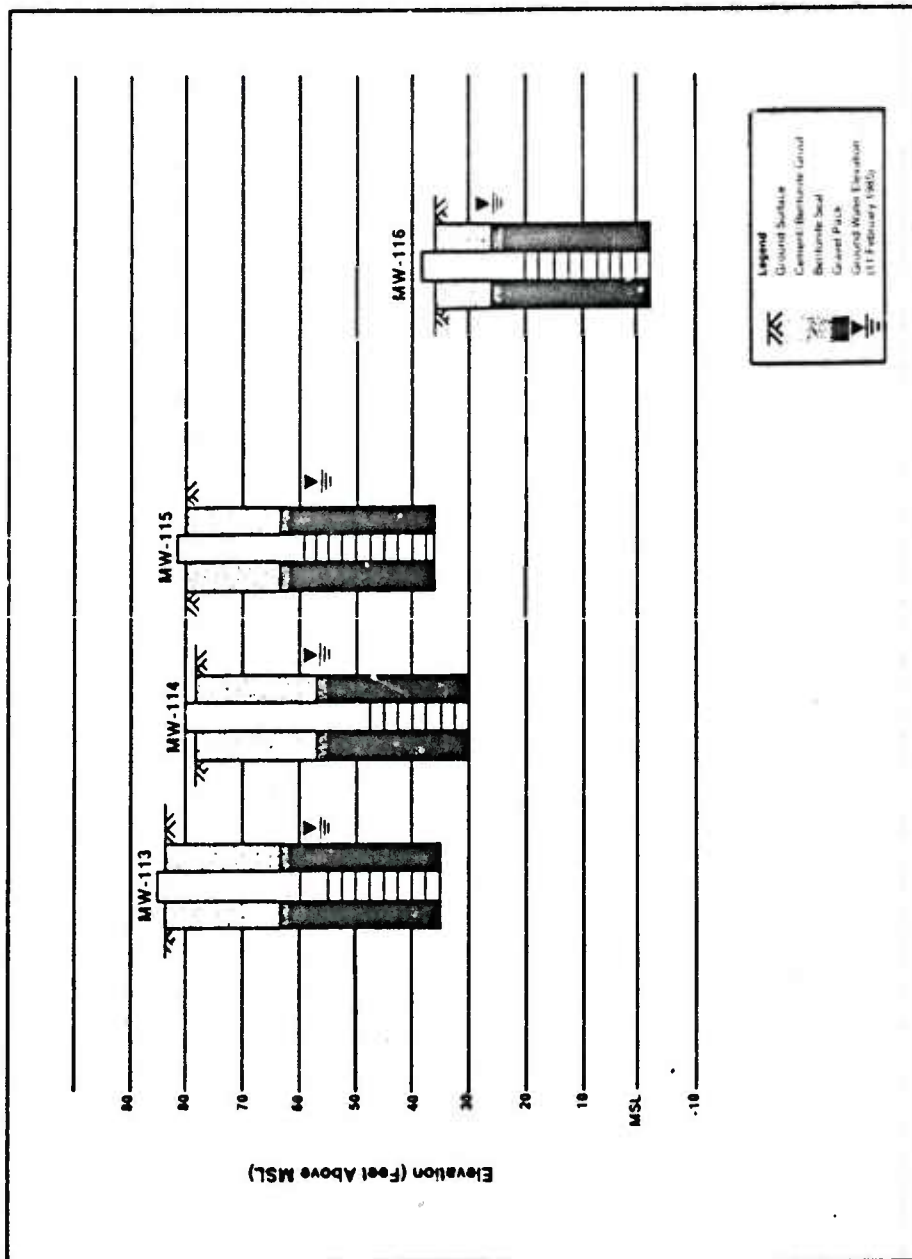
WELL CONSTRUCTION SUMMARY, LANDFILL NO. 3 AND JP-4 SPILL SITE
